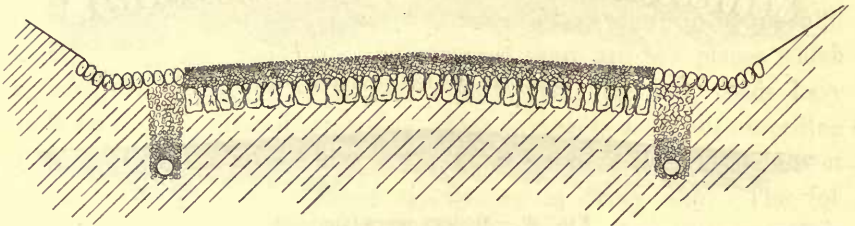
Section of a road cut through heavy or soggy soil with telford foundation and side-drains.
